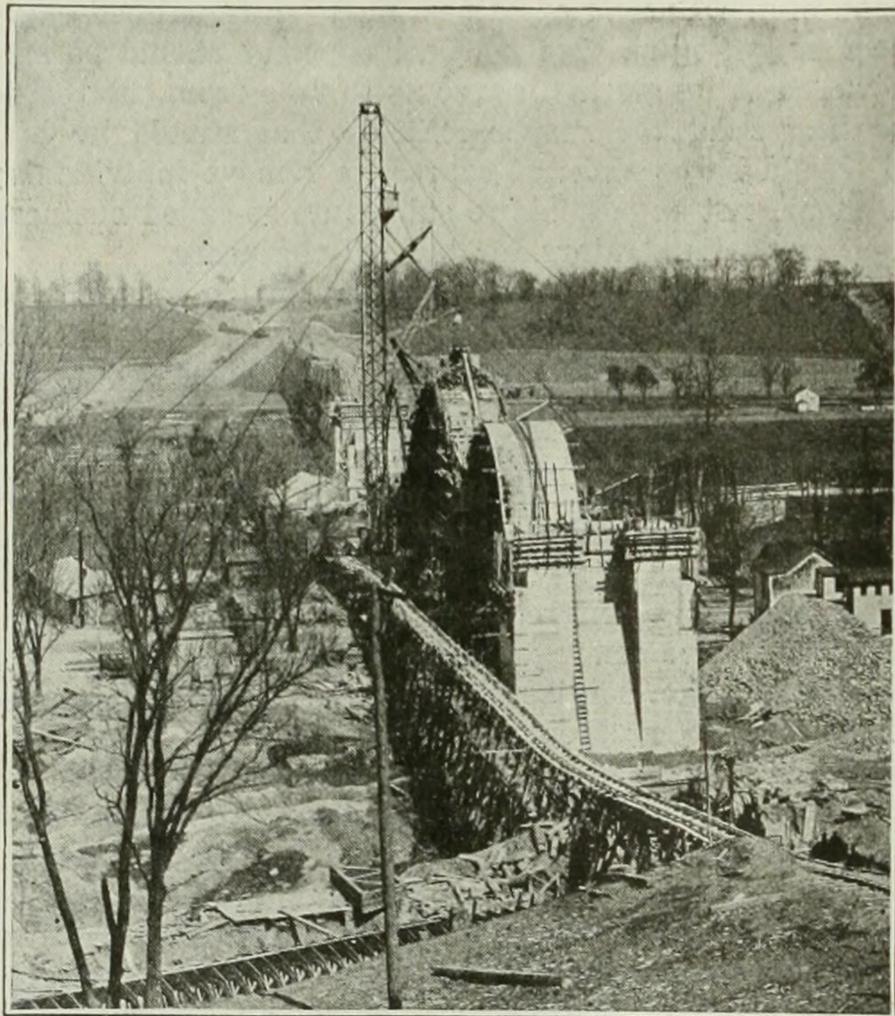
VIEW SHOWING LOCATION OF CONSTRUCTION PLANT
